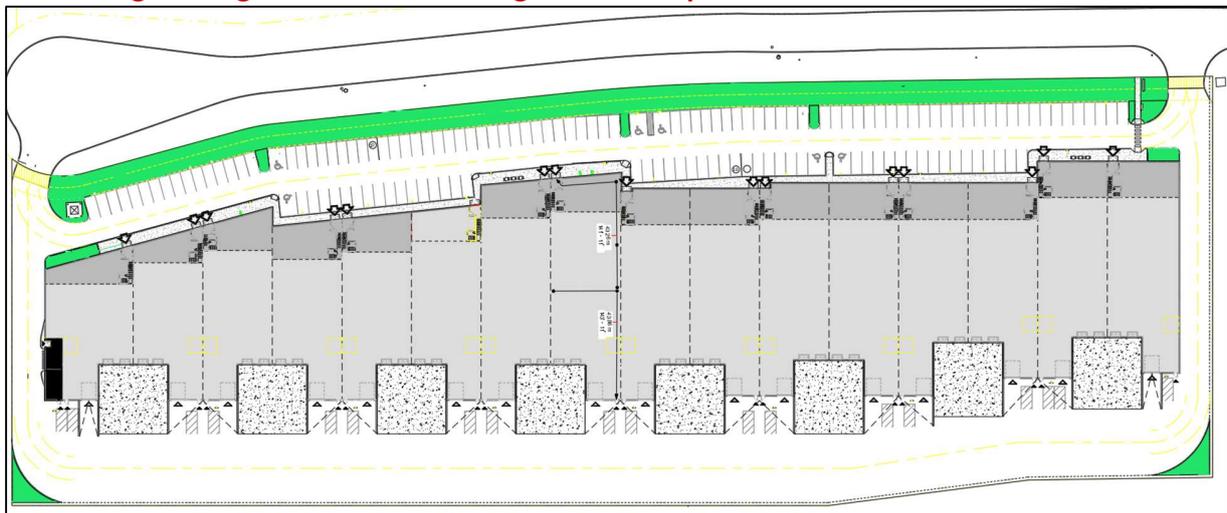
Approved Site Plan showing all landscaping, parking, and asphalt.
